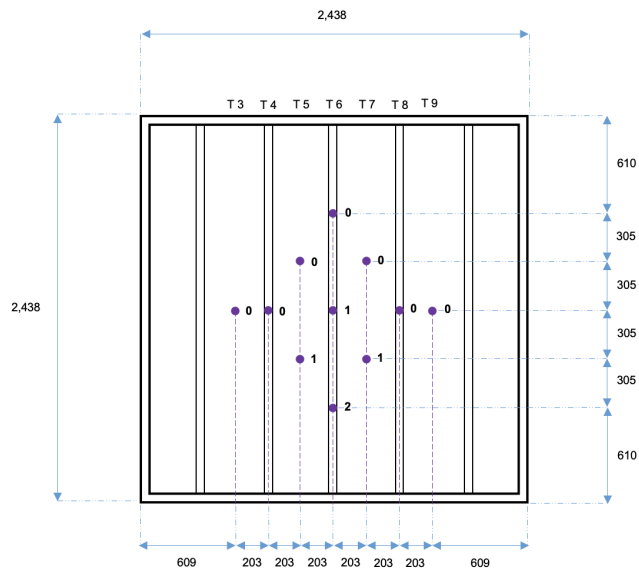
Details of instrumentation for the unexposed face of a test wall assembly
